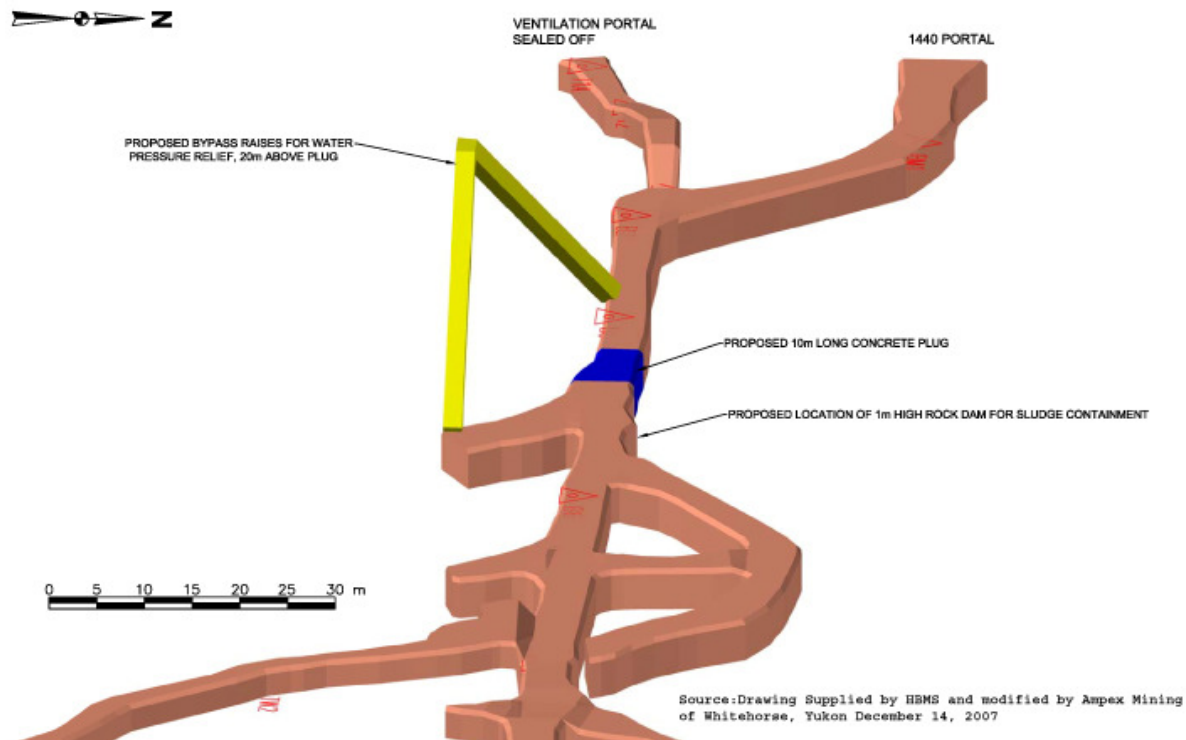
Tom underground workings oblique view of adit plug and bypass raise
